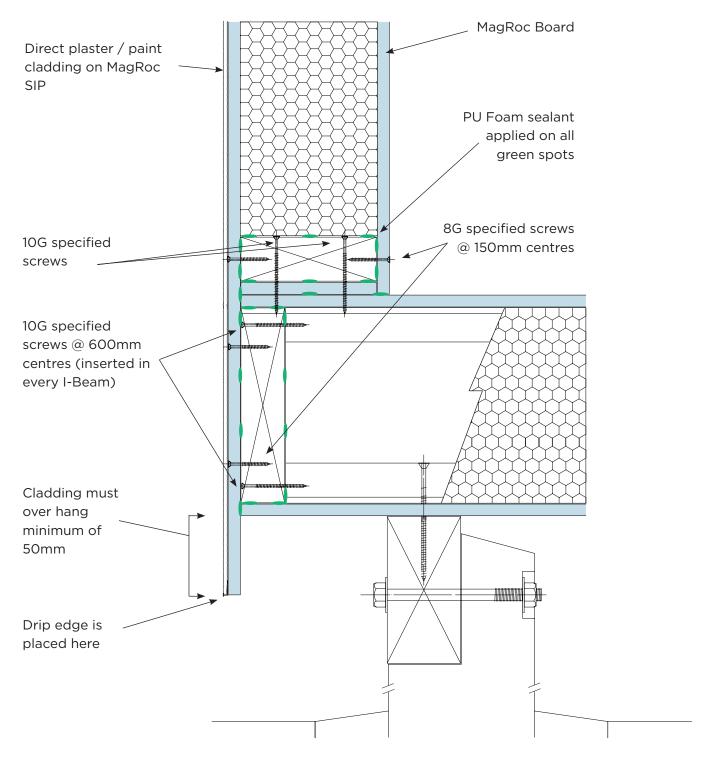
MagRoc 'Typical' Floor Detail - OverHang with Direct Cladding on Suspended Floor
